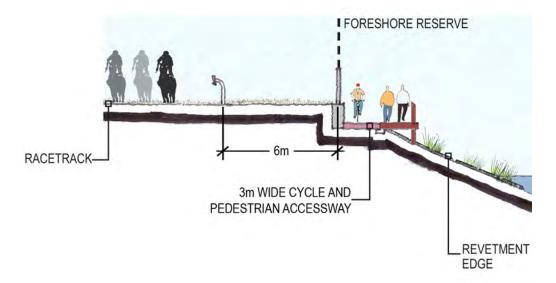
TYPICAL SECTION THROUGH BEACH COVE.
